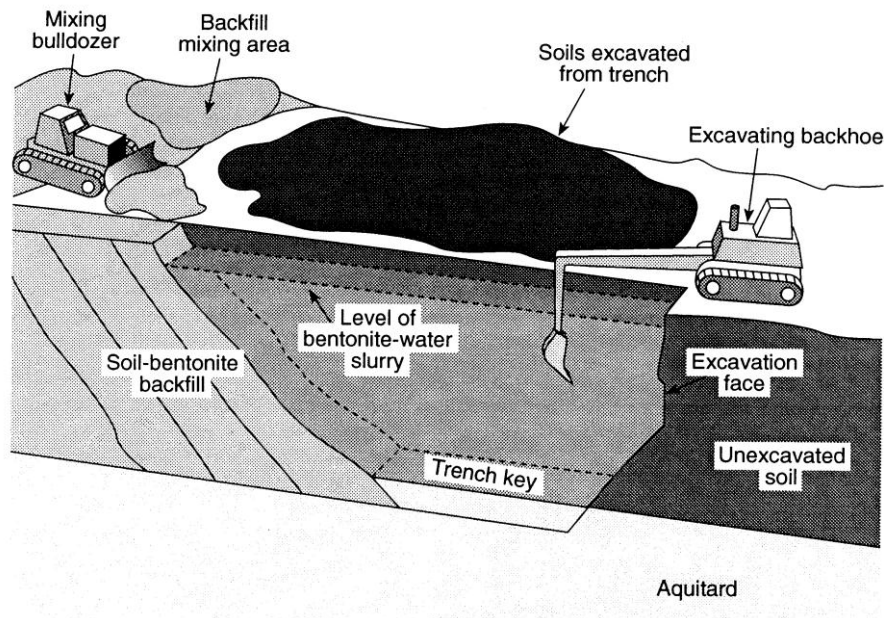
Soil-Bentonite Cutoff Wall Construction Process
